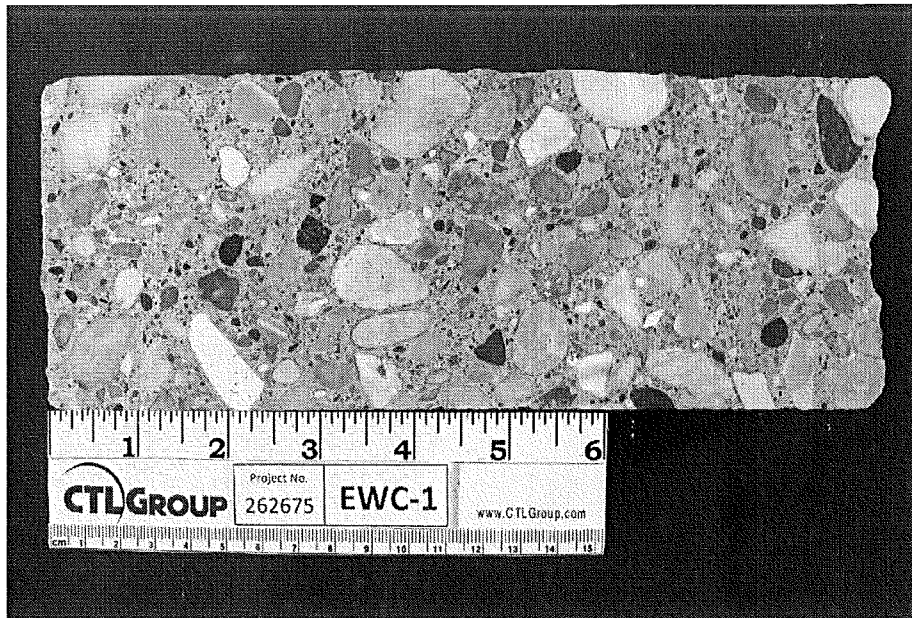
Cut and lapped section of Core EWC-1. Top surface at left. No apparent cracks/microcracks are observed in the core.
